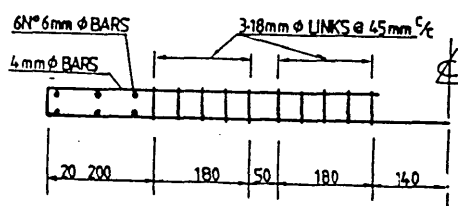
Reinforcement Details of a Typical Short Spanning Rib Cage
